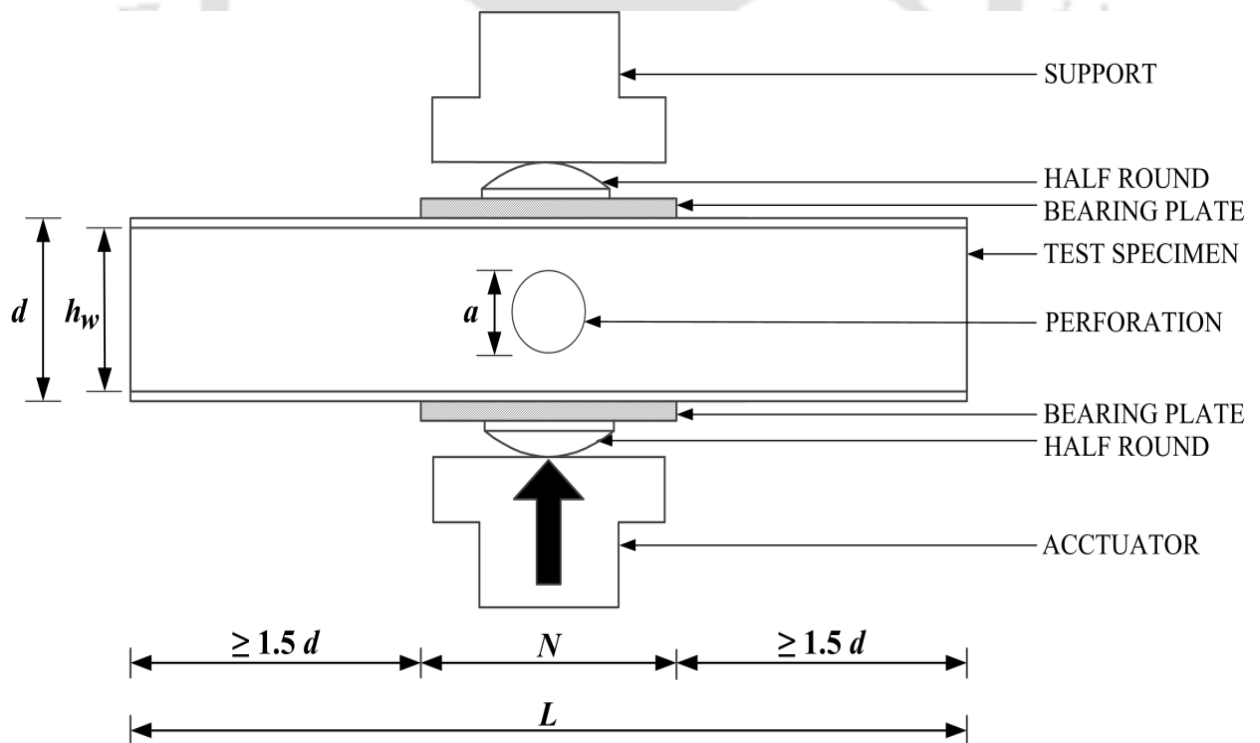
ITF loading arrangement for specimens with centred perforation (front view).
